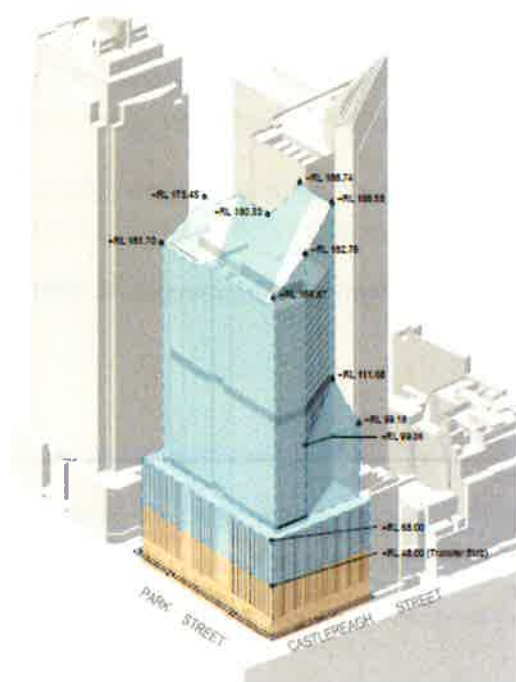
| Proposed building envelope with approved Metro station in yellow from Castlereagh Street. (Source: Applicant's EIS).
